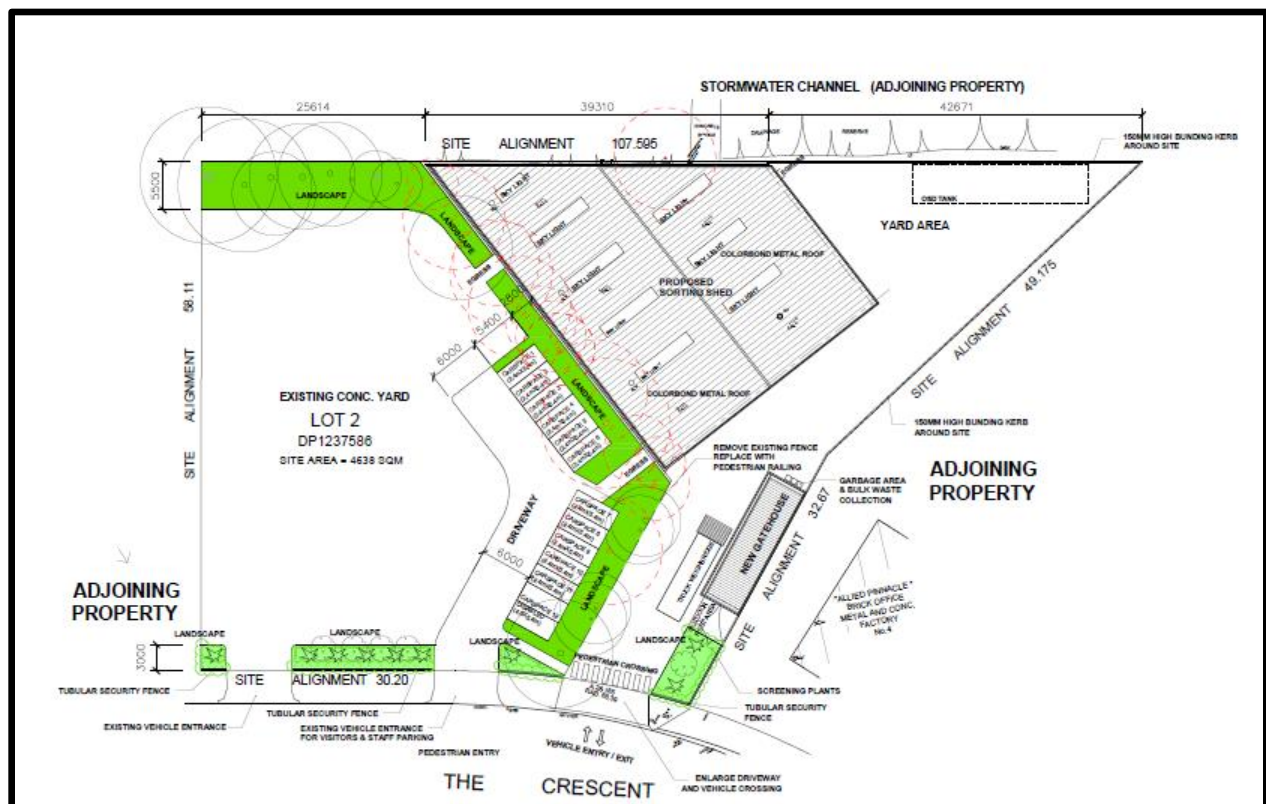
Updated Landscape Plan (courtesy: Robert Lee Architects, 2019)
